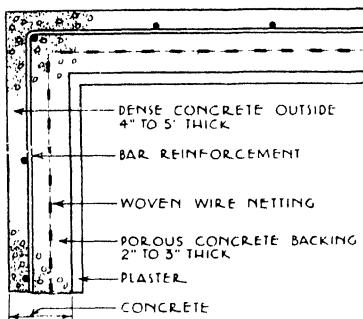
METHOD OF ERECTING MONOLITHIC WALL USING TWO QUALITIES OF CONCRETE
